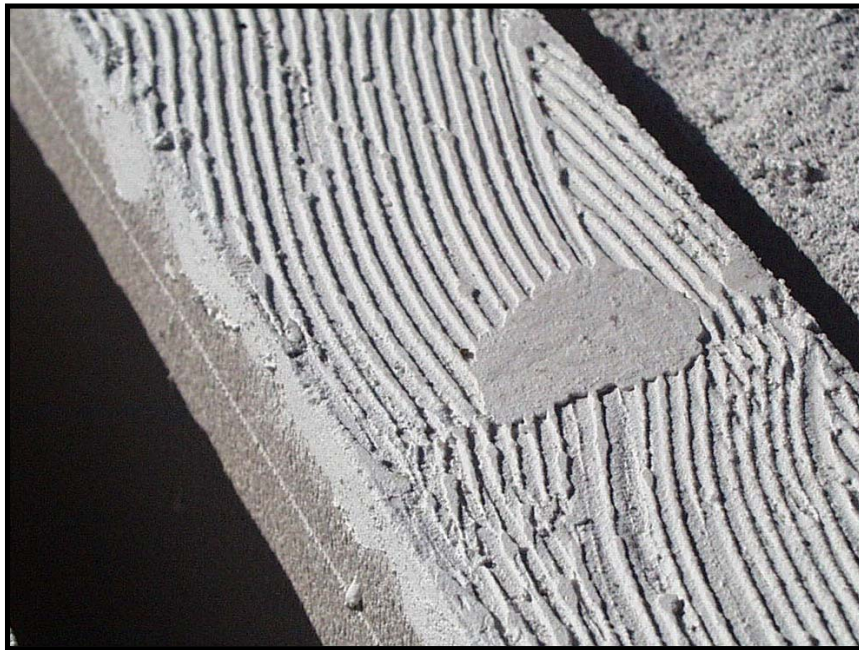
Typical thin-bed joint in Shear Wall Pilot Specimen 1
